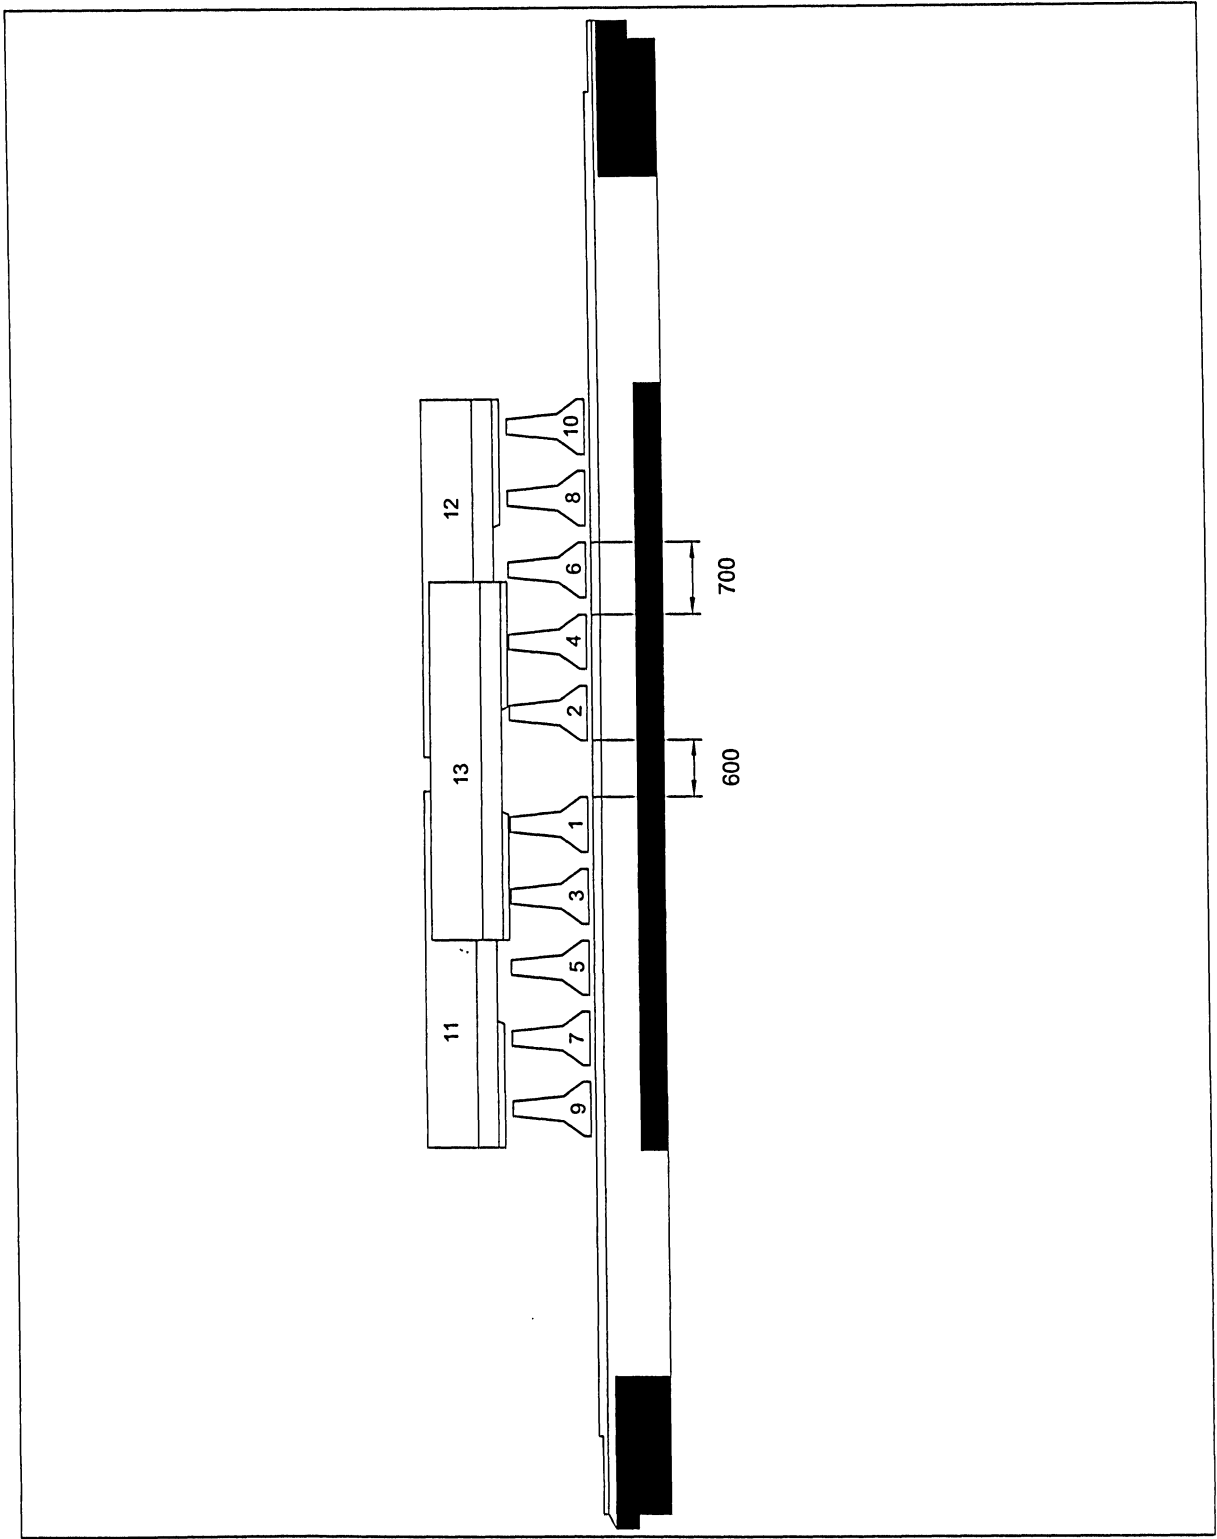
DT-41 girder barrier load application (Cofini, 2005)
